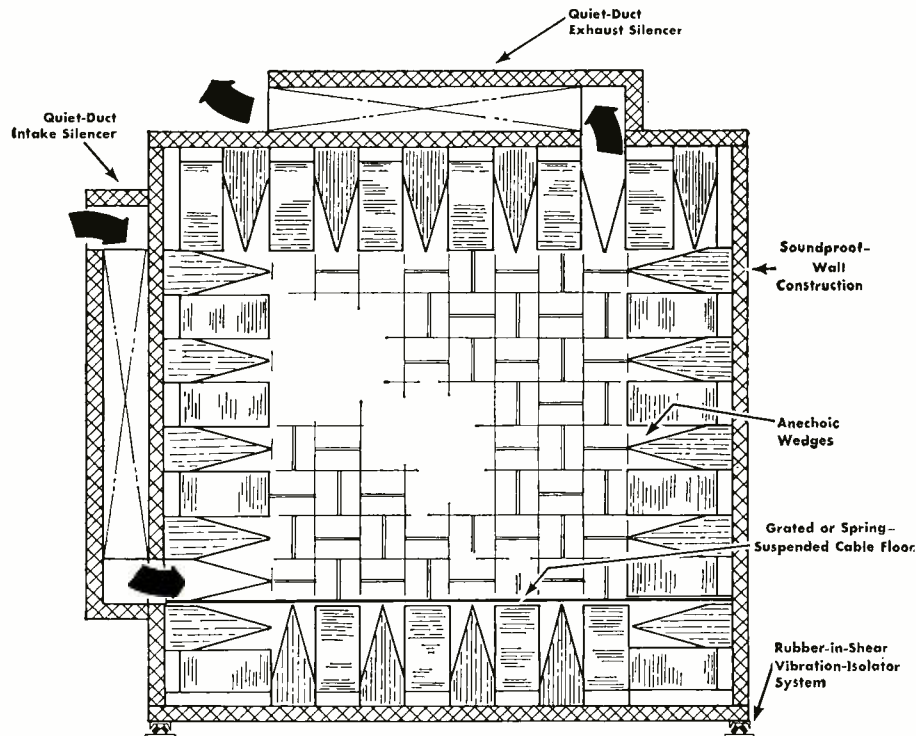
Cross-section of typical anechoic room showing details of construction. Note how the air ducts are specially designed to quiet the sound due to air motion.
